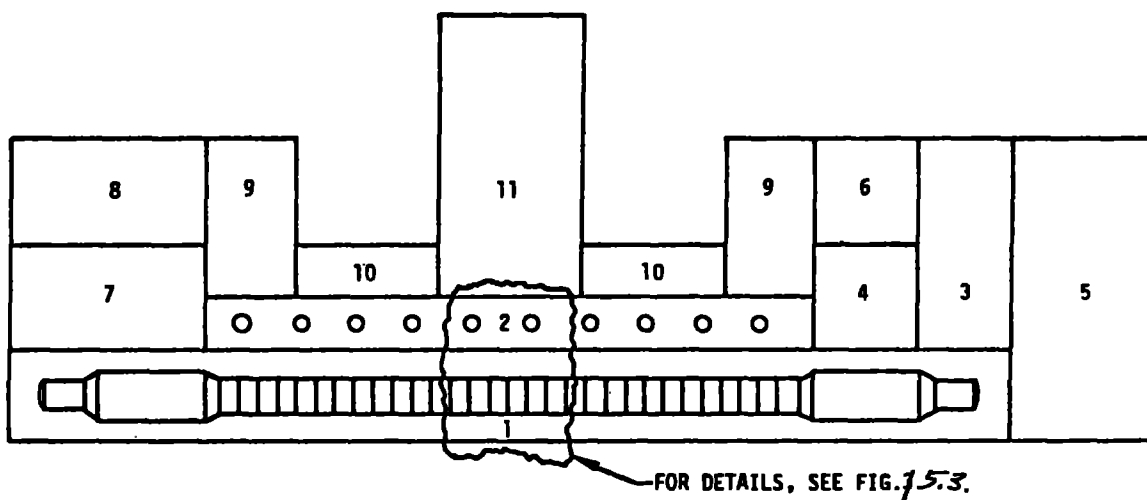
Diagram of plant arrangement: (1) Reactor building, (2) steam generator building, (3) tritium processing building, (4) molten salt processing building, (5) hot cell, (6) radwaste building, (7) component cooling building, (8) plant auxiliary building, (9) power supply building, (10) cryogenics building, and (11) turbine building. Buildings 1 through 5 constitute the Fusion Island.
